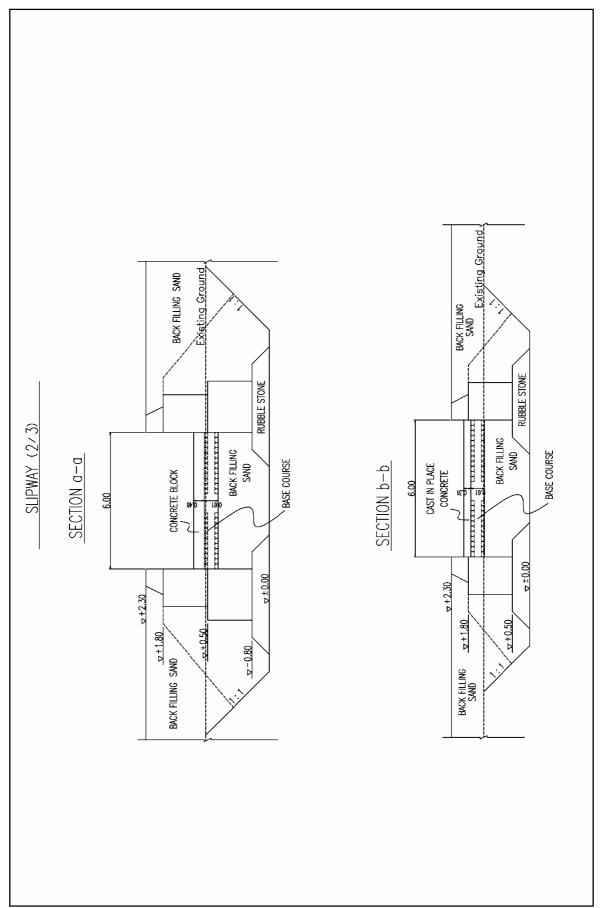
Plan and Cross-section of Slipway (East – West Direction)
